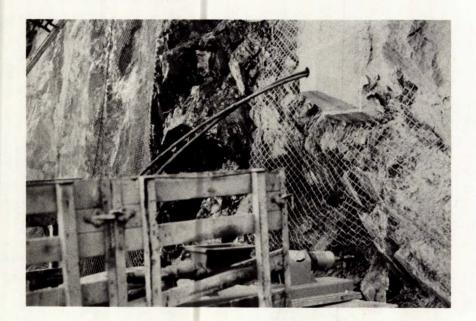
A completed surface anchorage showing the concrete bearing block. A grout tube can be seen emerging next to the anchor cable.
